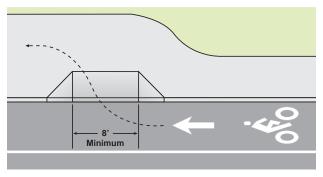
Ramp allows bicycle to access sidewalk on bridge
